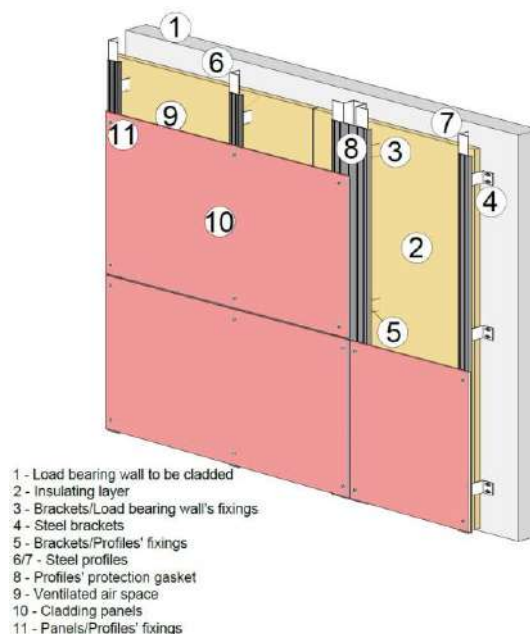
Example of a ventilated facade package with a steel subframe, mounted on the load-bearing wall
